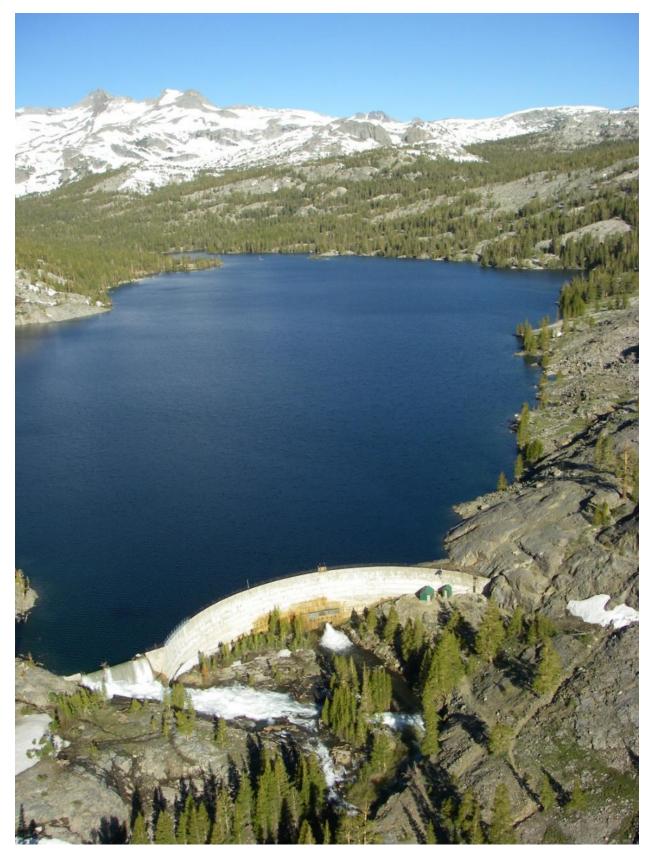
Rush Meadows Dam and Waugh Lake, High Water Level (looking west)
